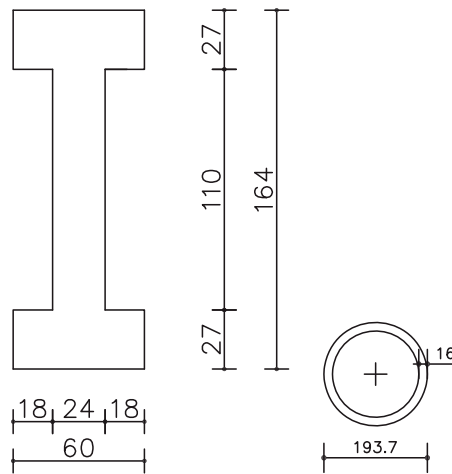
Double-T-shaped section of the concrete beam (on the left). Dimensions are expressed in [cm]. Circular hollow section (CHS) of the steel arch beam (on the right). Dimensions are expressed in [mm].
